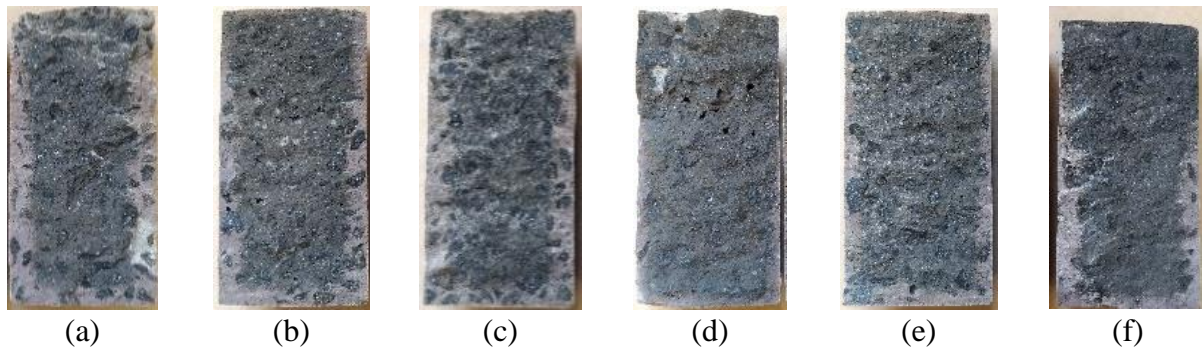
Fractured specimens after colorimetric test - 8 weeks:
